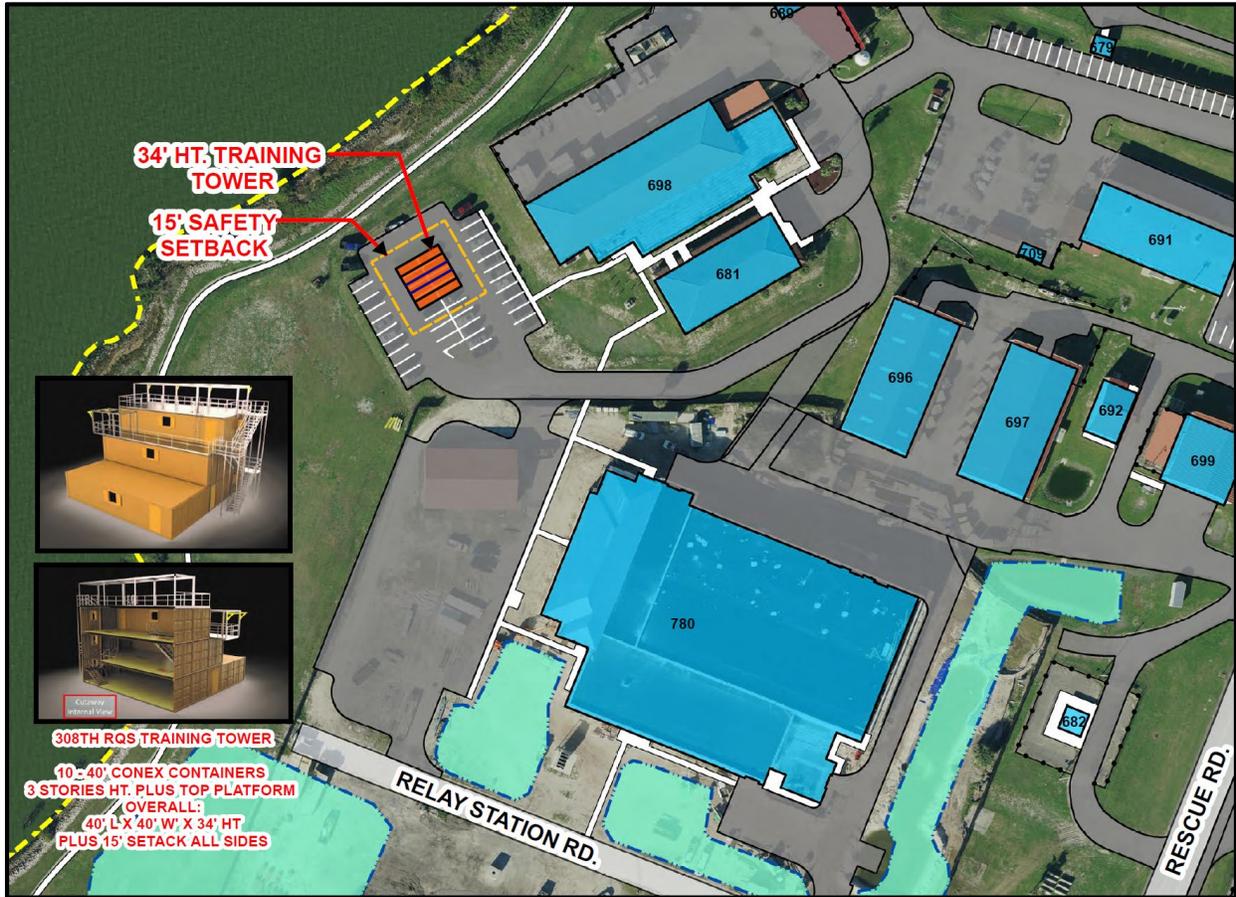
Proposed Location of the Multipurpose Training Tower
